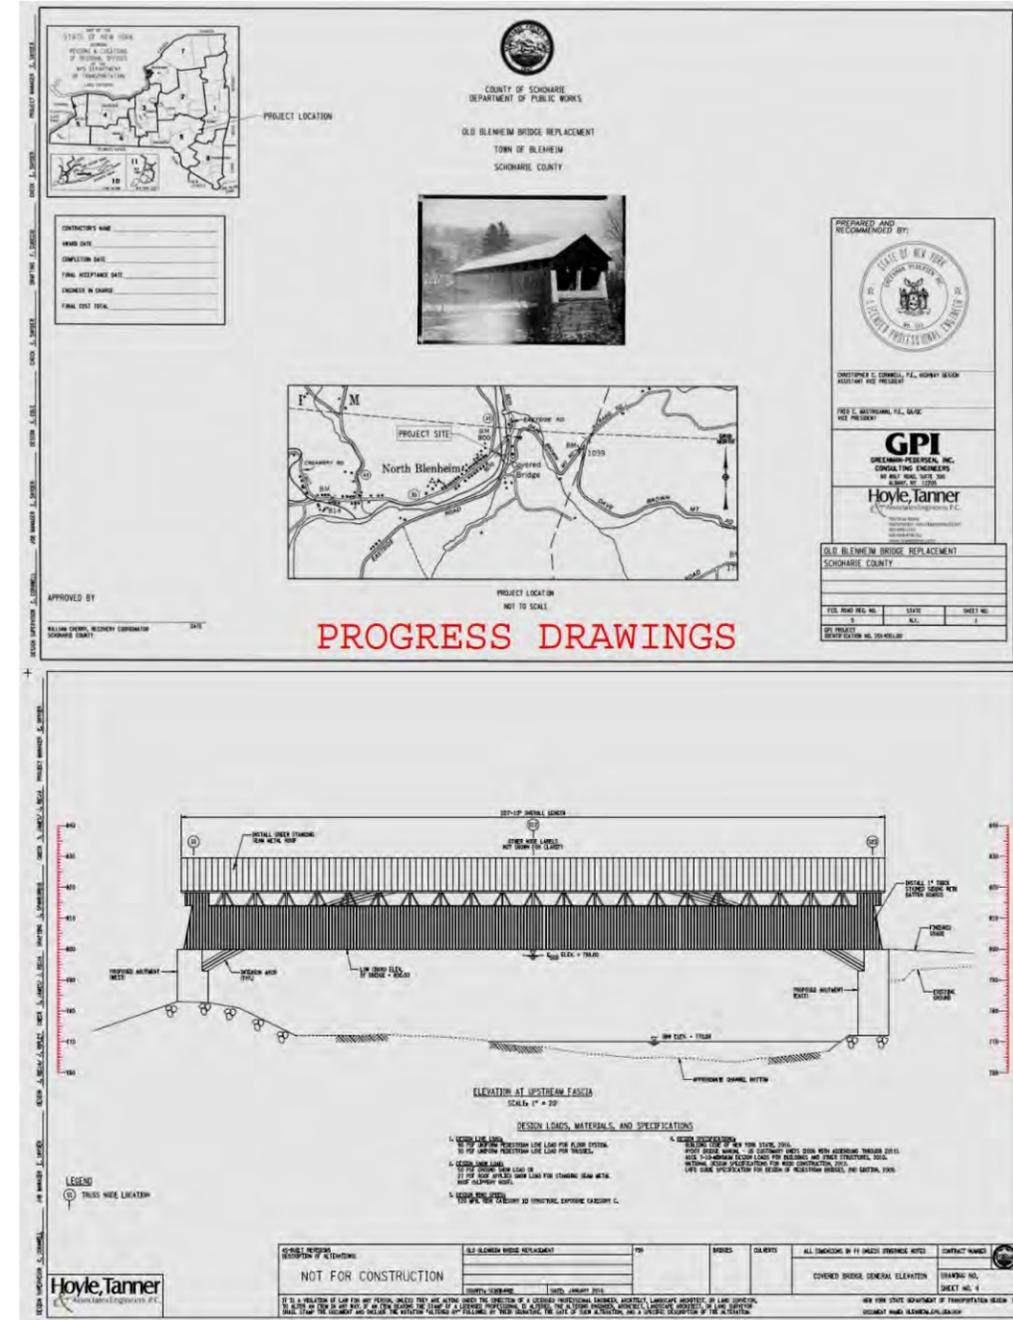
and Figure 10 – Excerpts from the Preliminary Plans for the Reconstruction of the Blenheim Bridge
